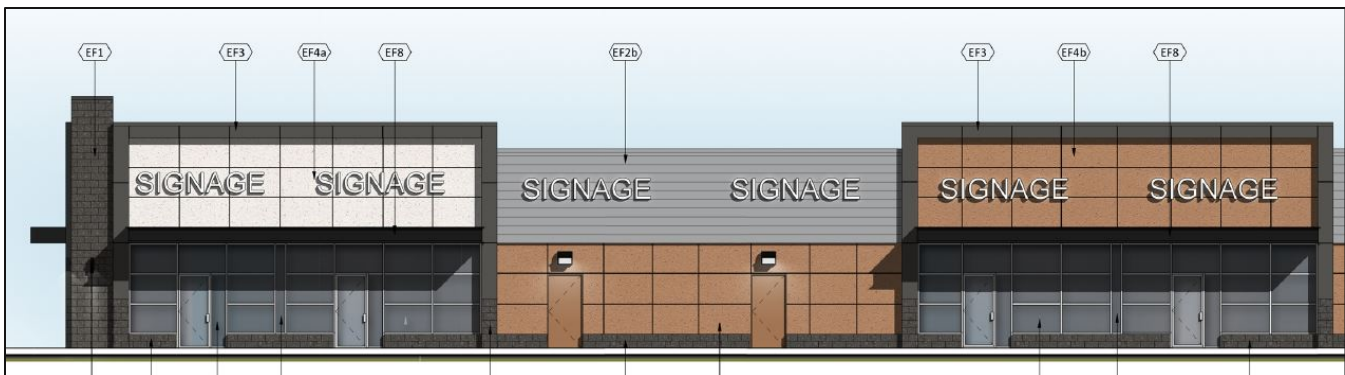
Typical Retail Elevations (source: Turner Fleischer).
